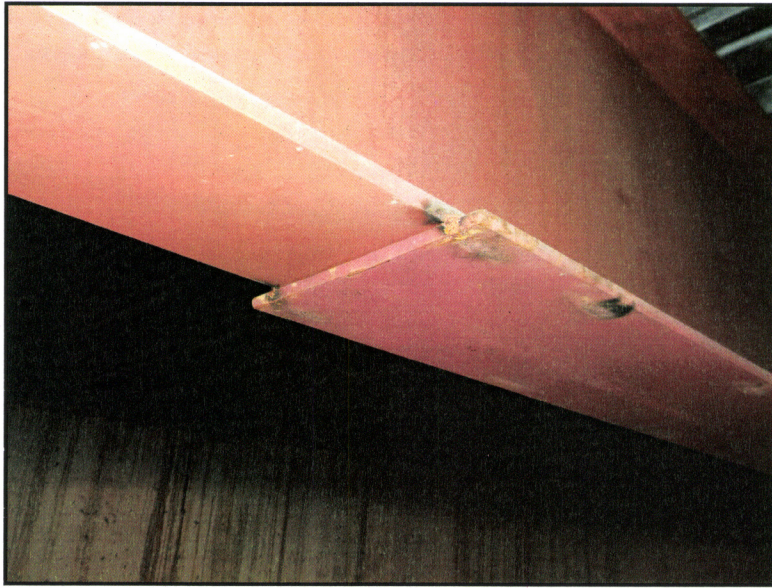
Steel Plate Welded to W18x40 Beam
